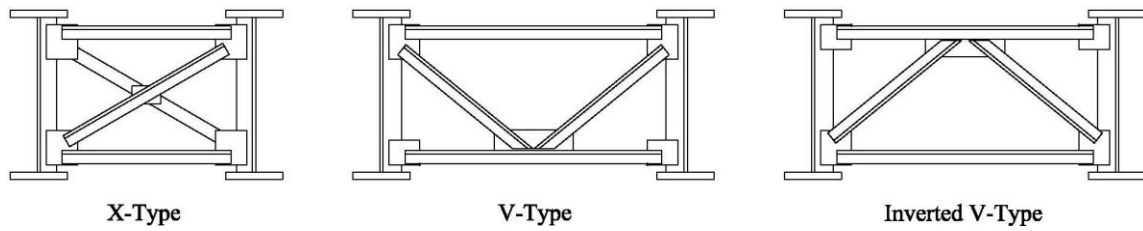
Cross-frame configurations used for steel I-girder bridges
